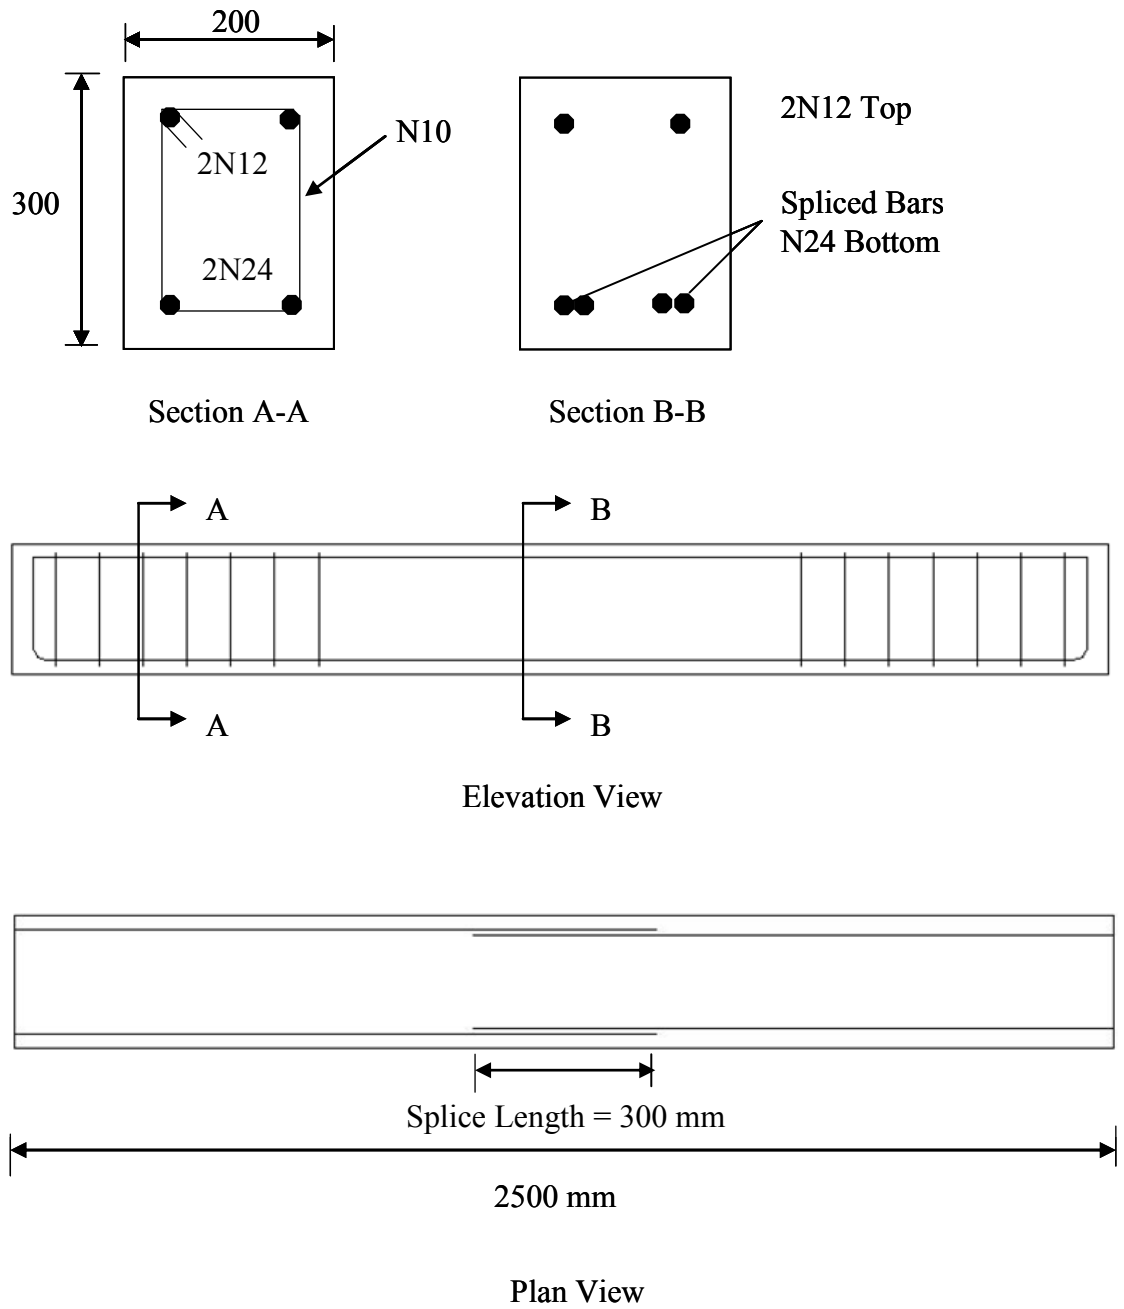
Geometry and Reinforcement Arrangement for Beams N-L-12.5 and H-L-12.5
